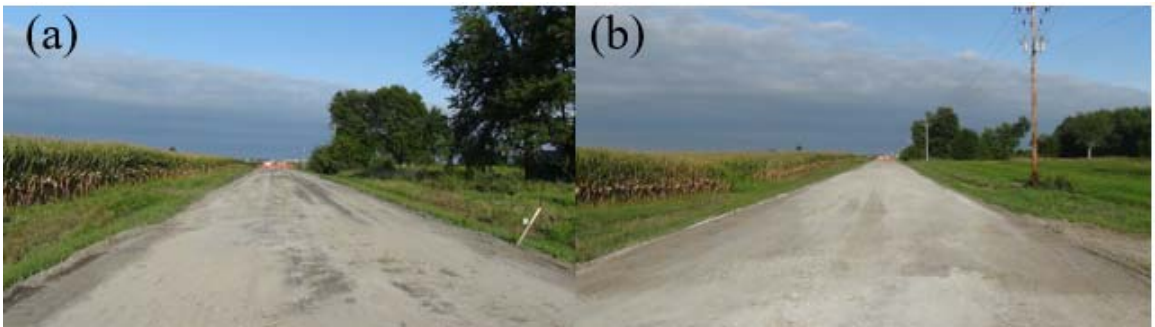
(a) Cement treated surface section (b) Cement treated subgrade section in Washington County at end of construction
